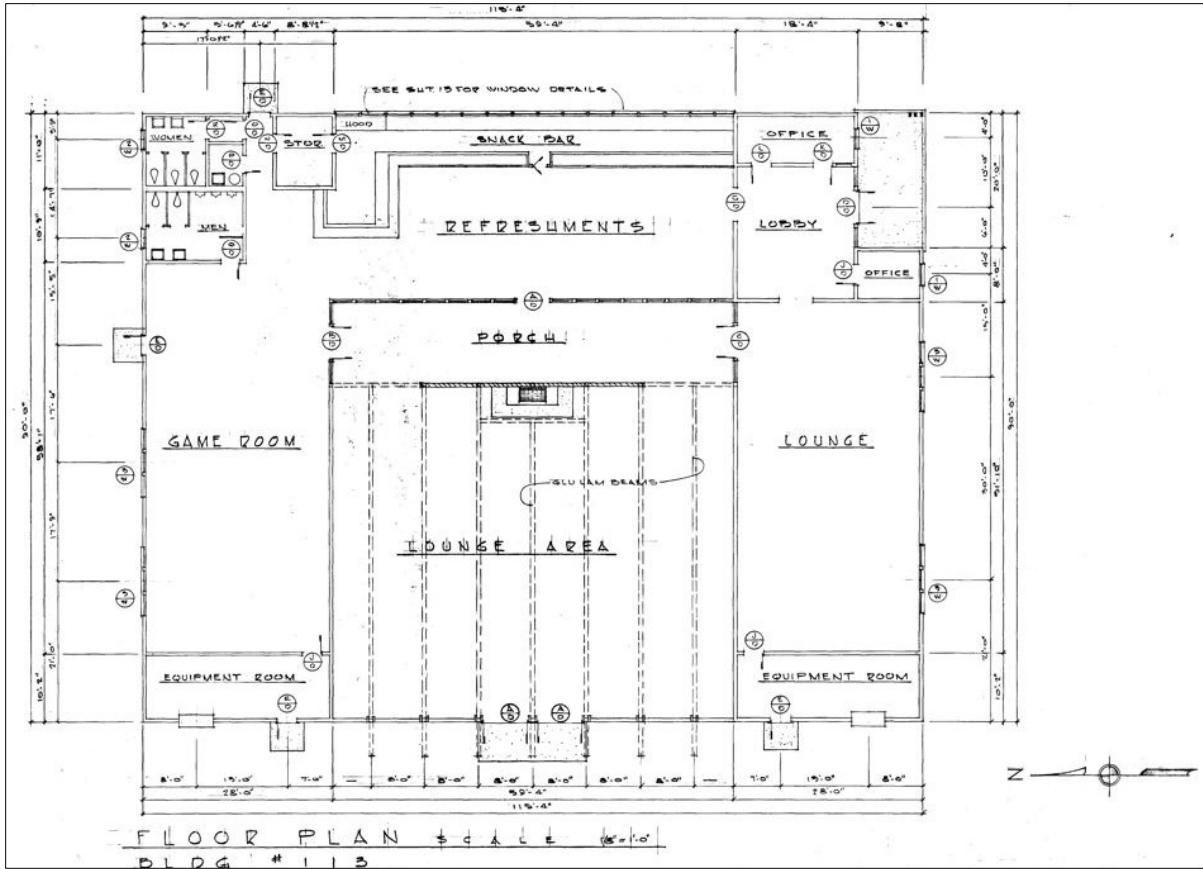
Building 23-113 floor plan, August 5, 1965 (H&N 1965).
